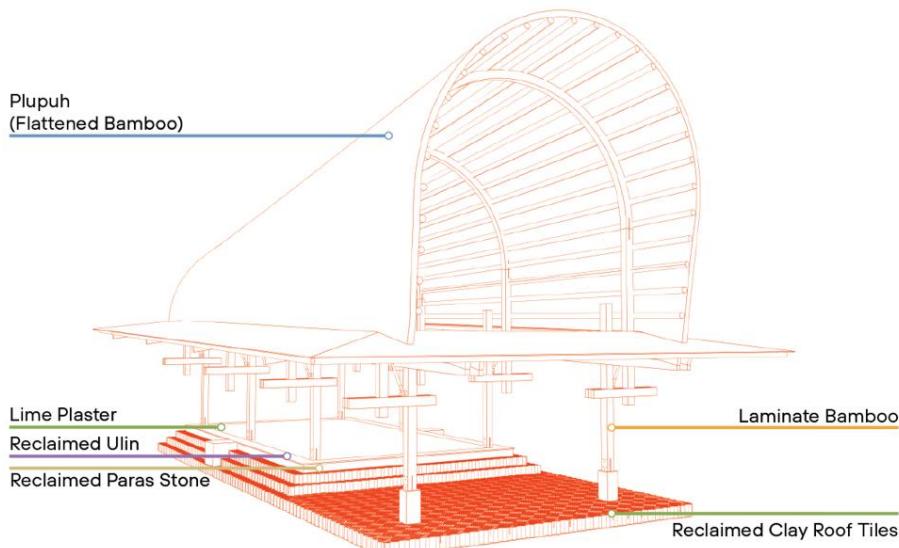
Demonstrator Building BaleBio - details of all construction materials.
